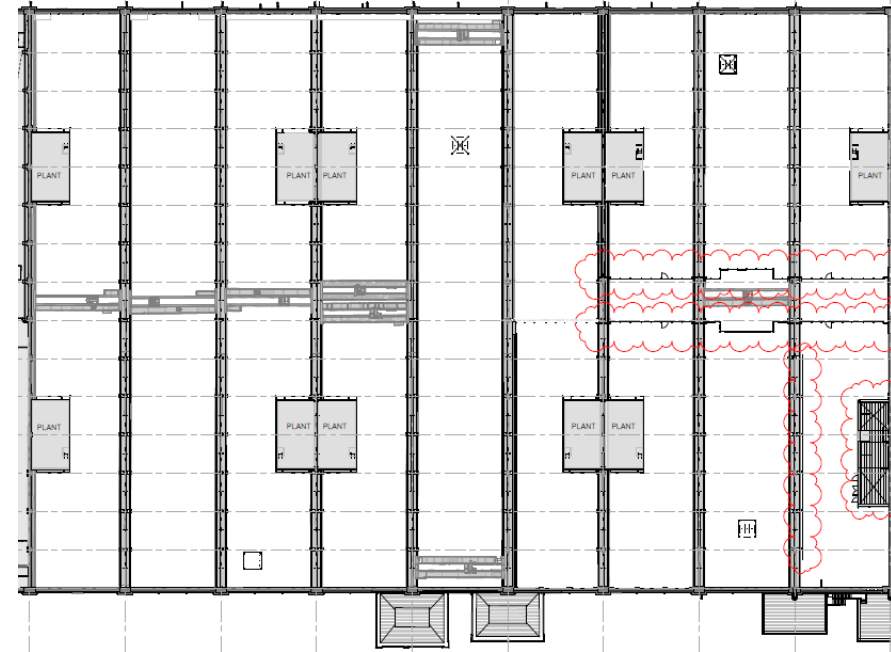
Proposed Second Floor Plan (Source: Sissons, 2020)
